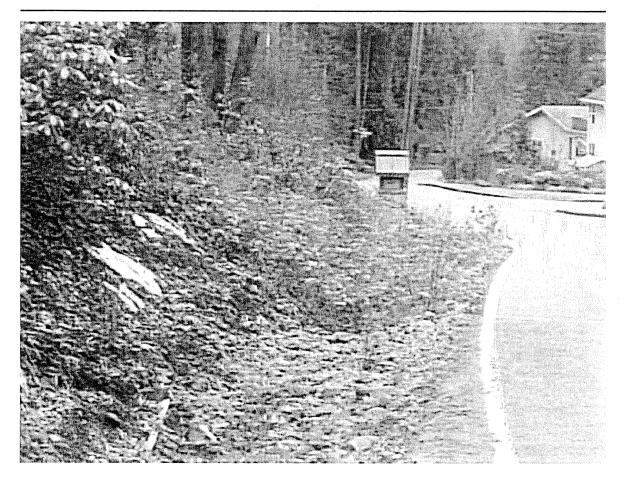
Looking southwest along the east margin of SE 24th Way, near the SE 27th PL intersection.
